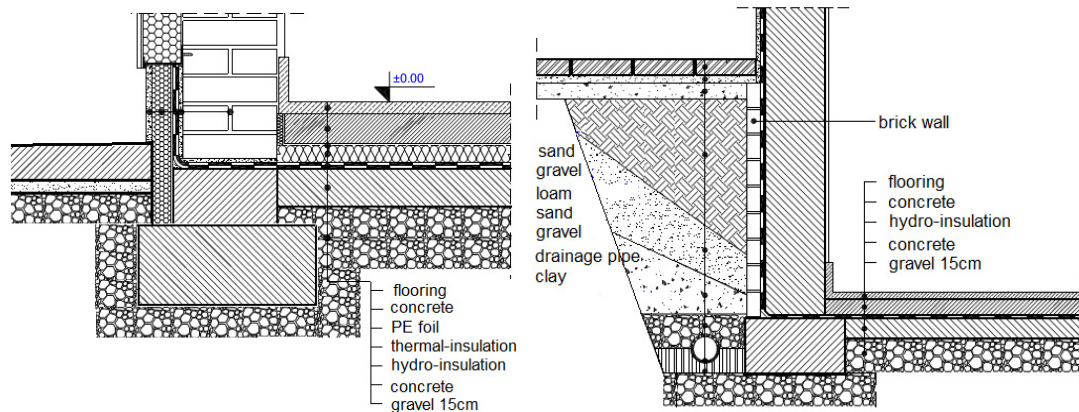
Construction of foundations, in case when the floor is at the level of the surrounding area and in case when there are dug-in rooms
